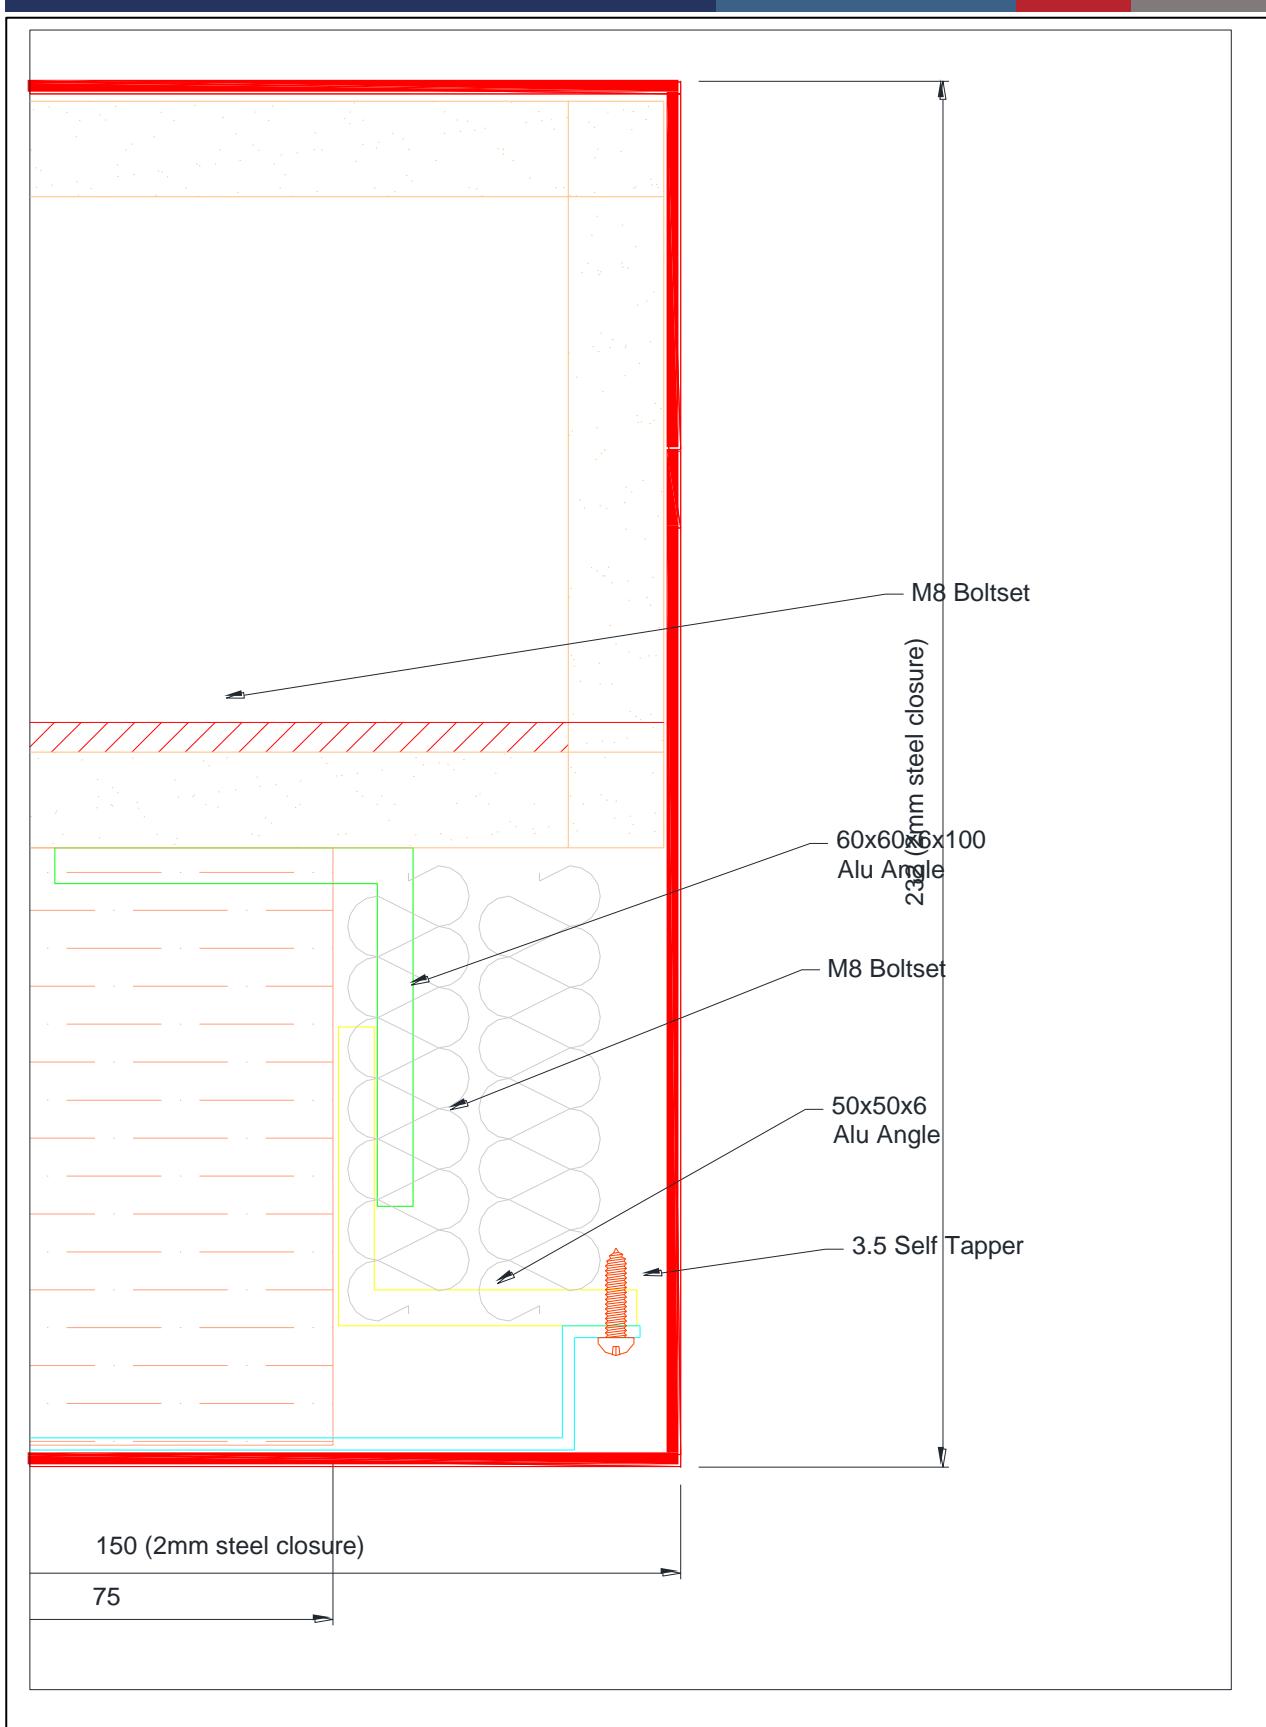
Detail D07 (Left vertical edge of the wall) of the specimen.
